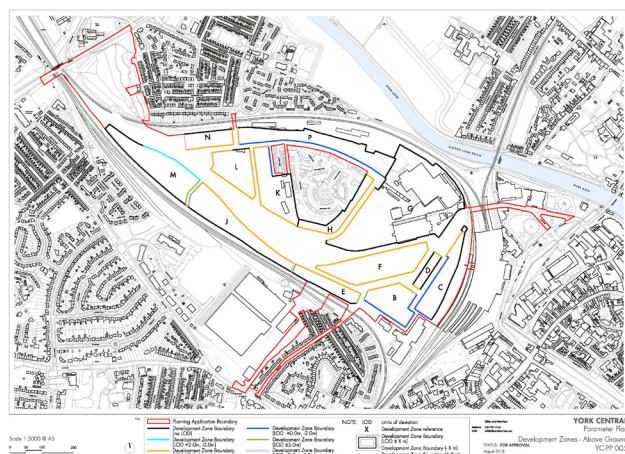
Parameter Plan 005 Development Zones - Above Ground
